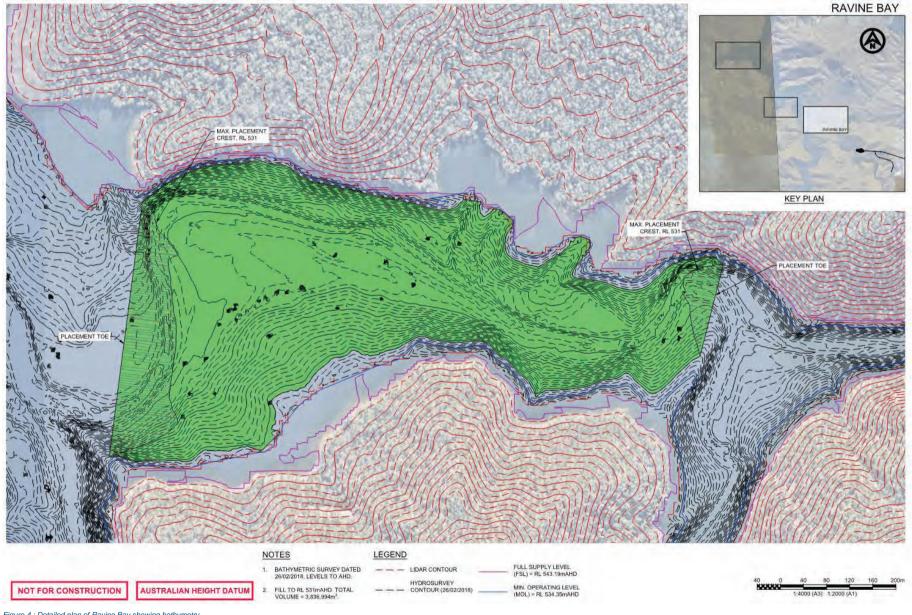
Detailed plan of Ravine Bay showing bathymetry
